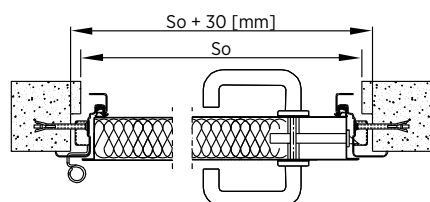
Installation of the single-leaf door with the corner frame in a masonry wall, horizontal cross-section
